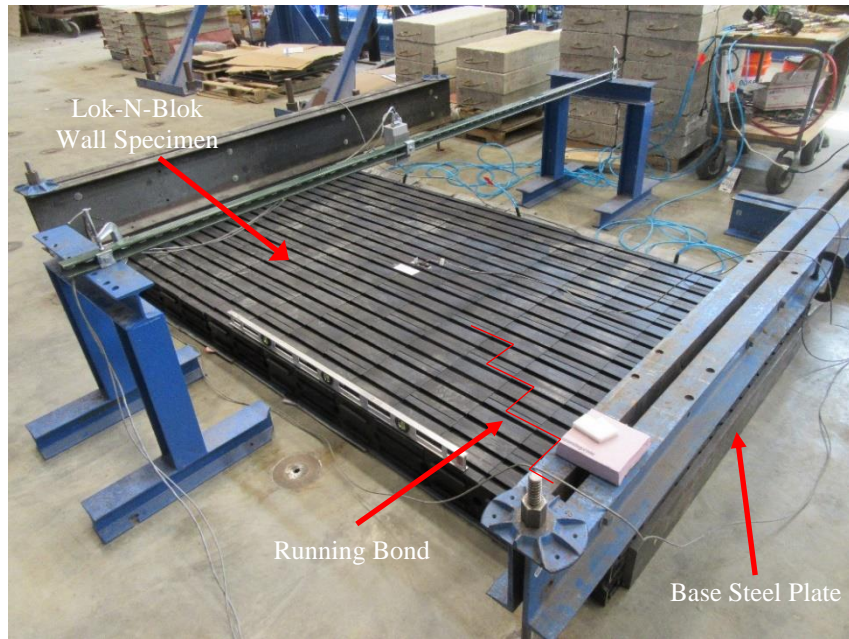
Transverse Load Testing Frame and Lok-N-Blok Wall Assembly
